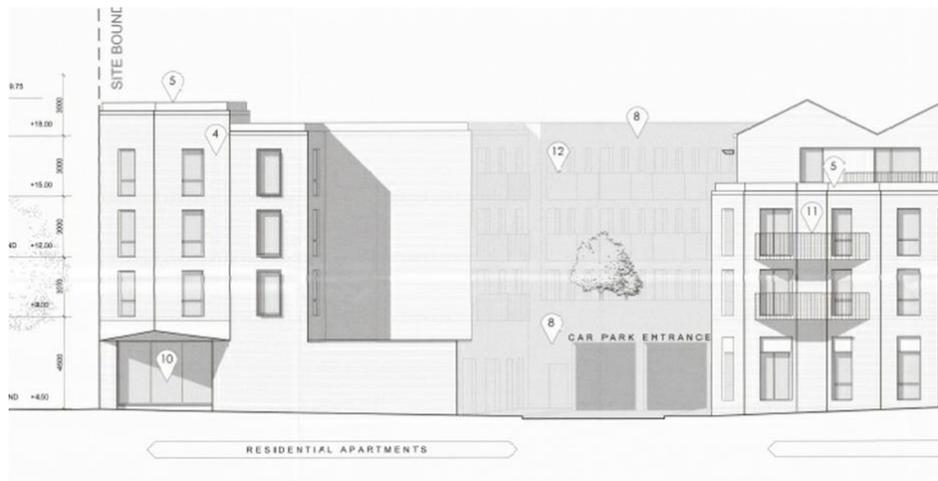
Extract from Southwell Road Elevation (January 2020 drawing)
